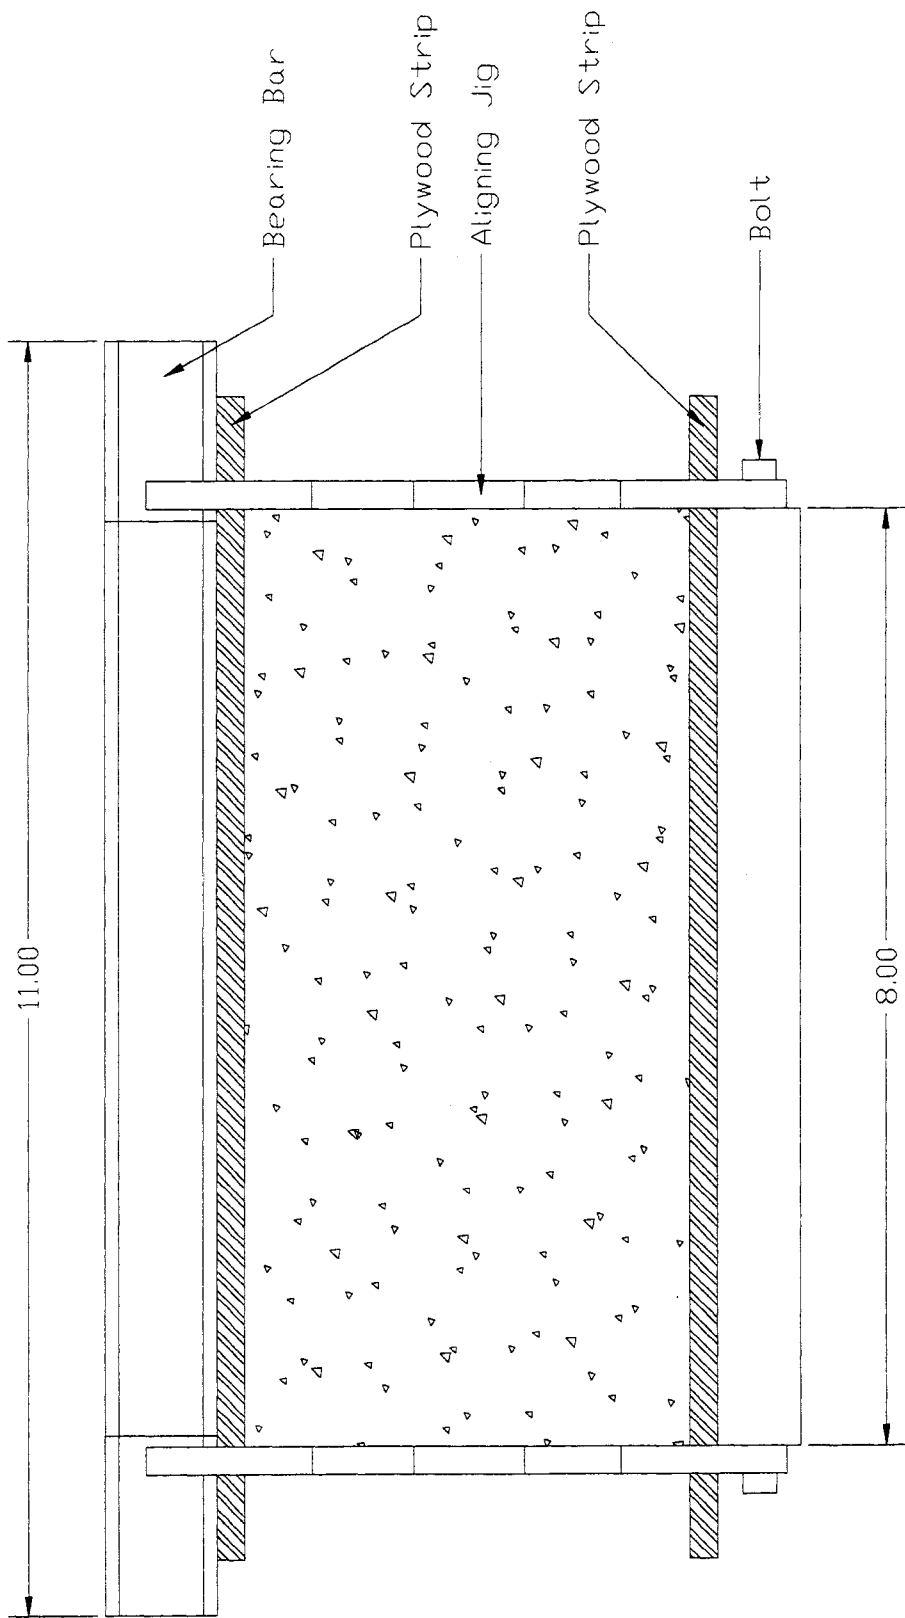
Side view of the jig used for aligning concrete cylinder and bearing strips. A similar aligning jig was constructed for use with 6 x 12 in. (150 x 300 mm) specimens. [SPLT4_1.PLT]
